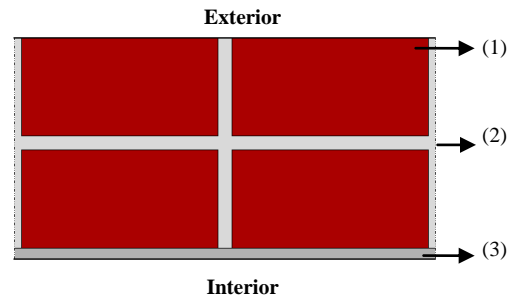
Representation of the historical wall (horizontal section). (1) Brick wall; (2) Mortar joints; (3) Indoor surface coating.
